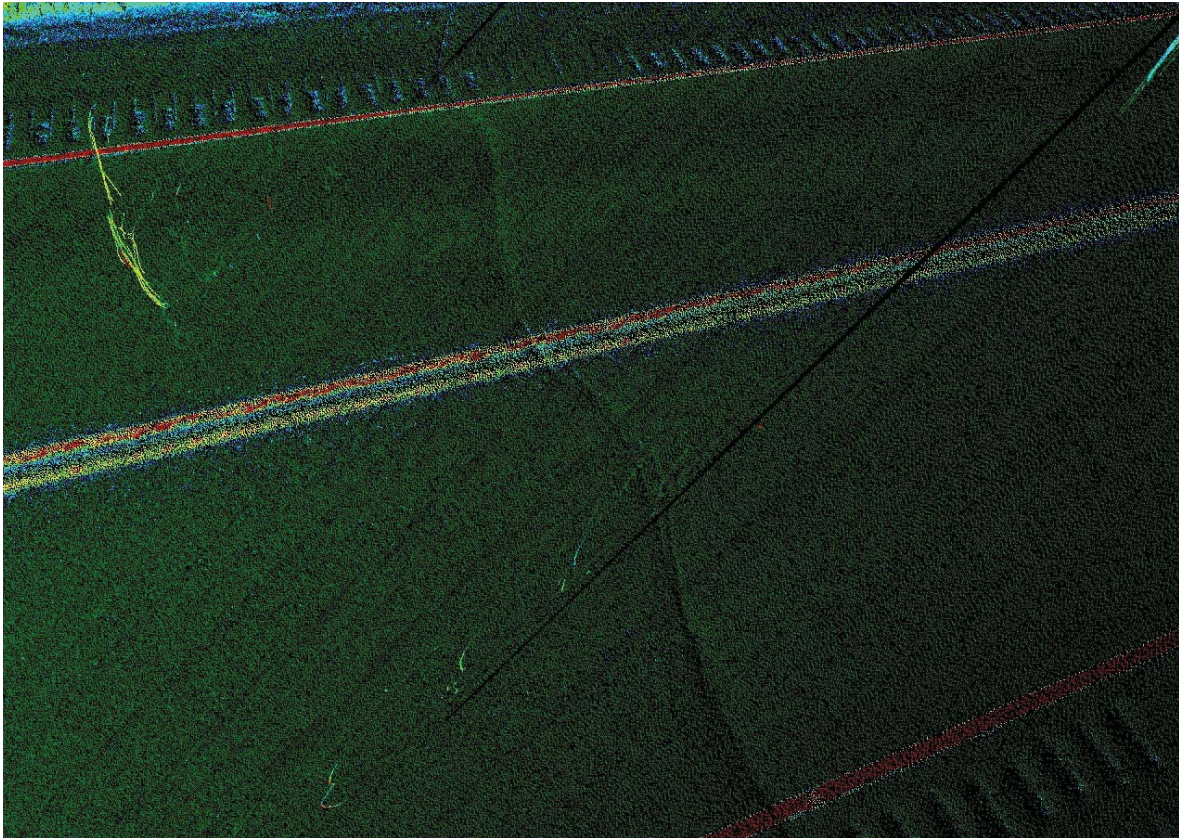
Intensity shaded point cloud highlighting a large crack observed in the road way.
